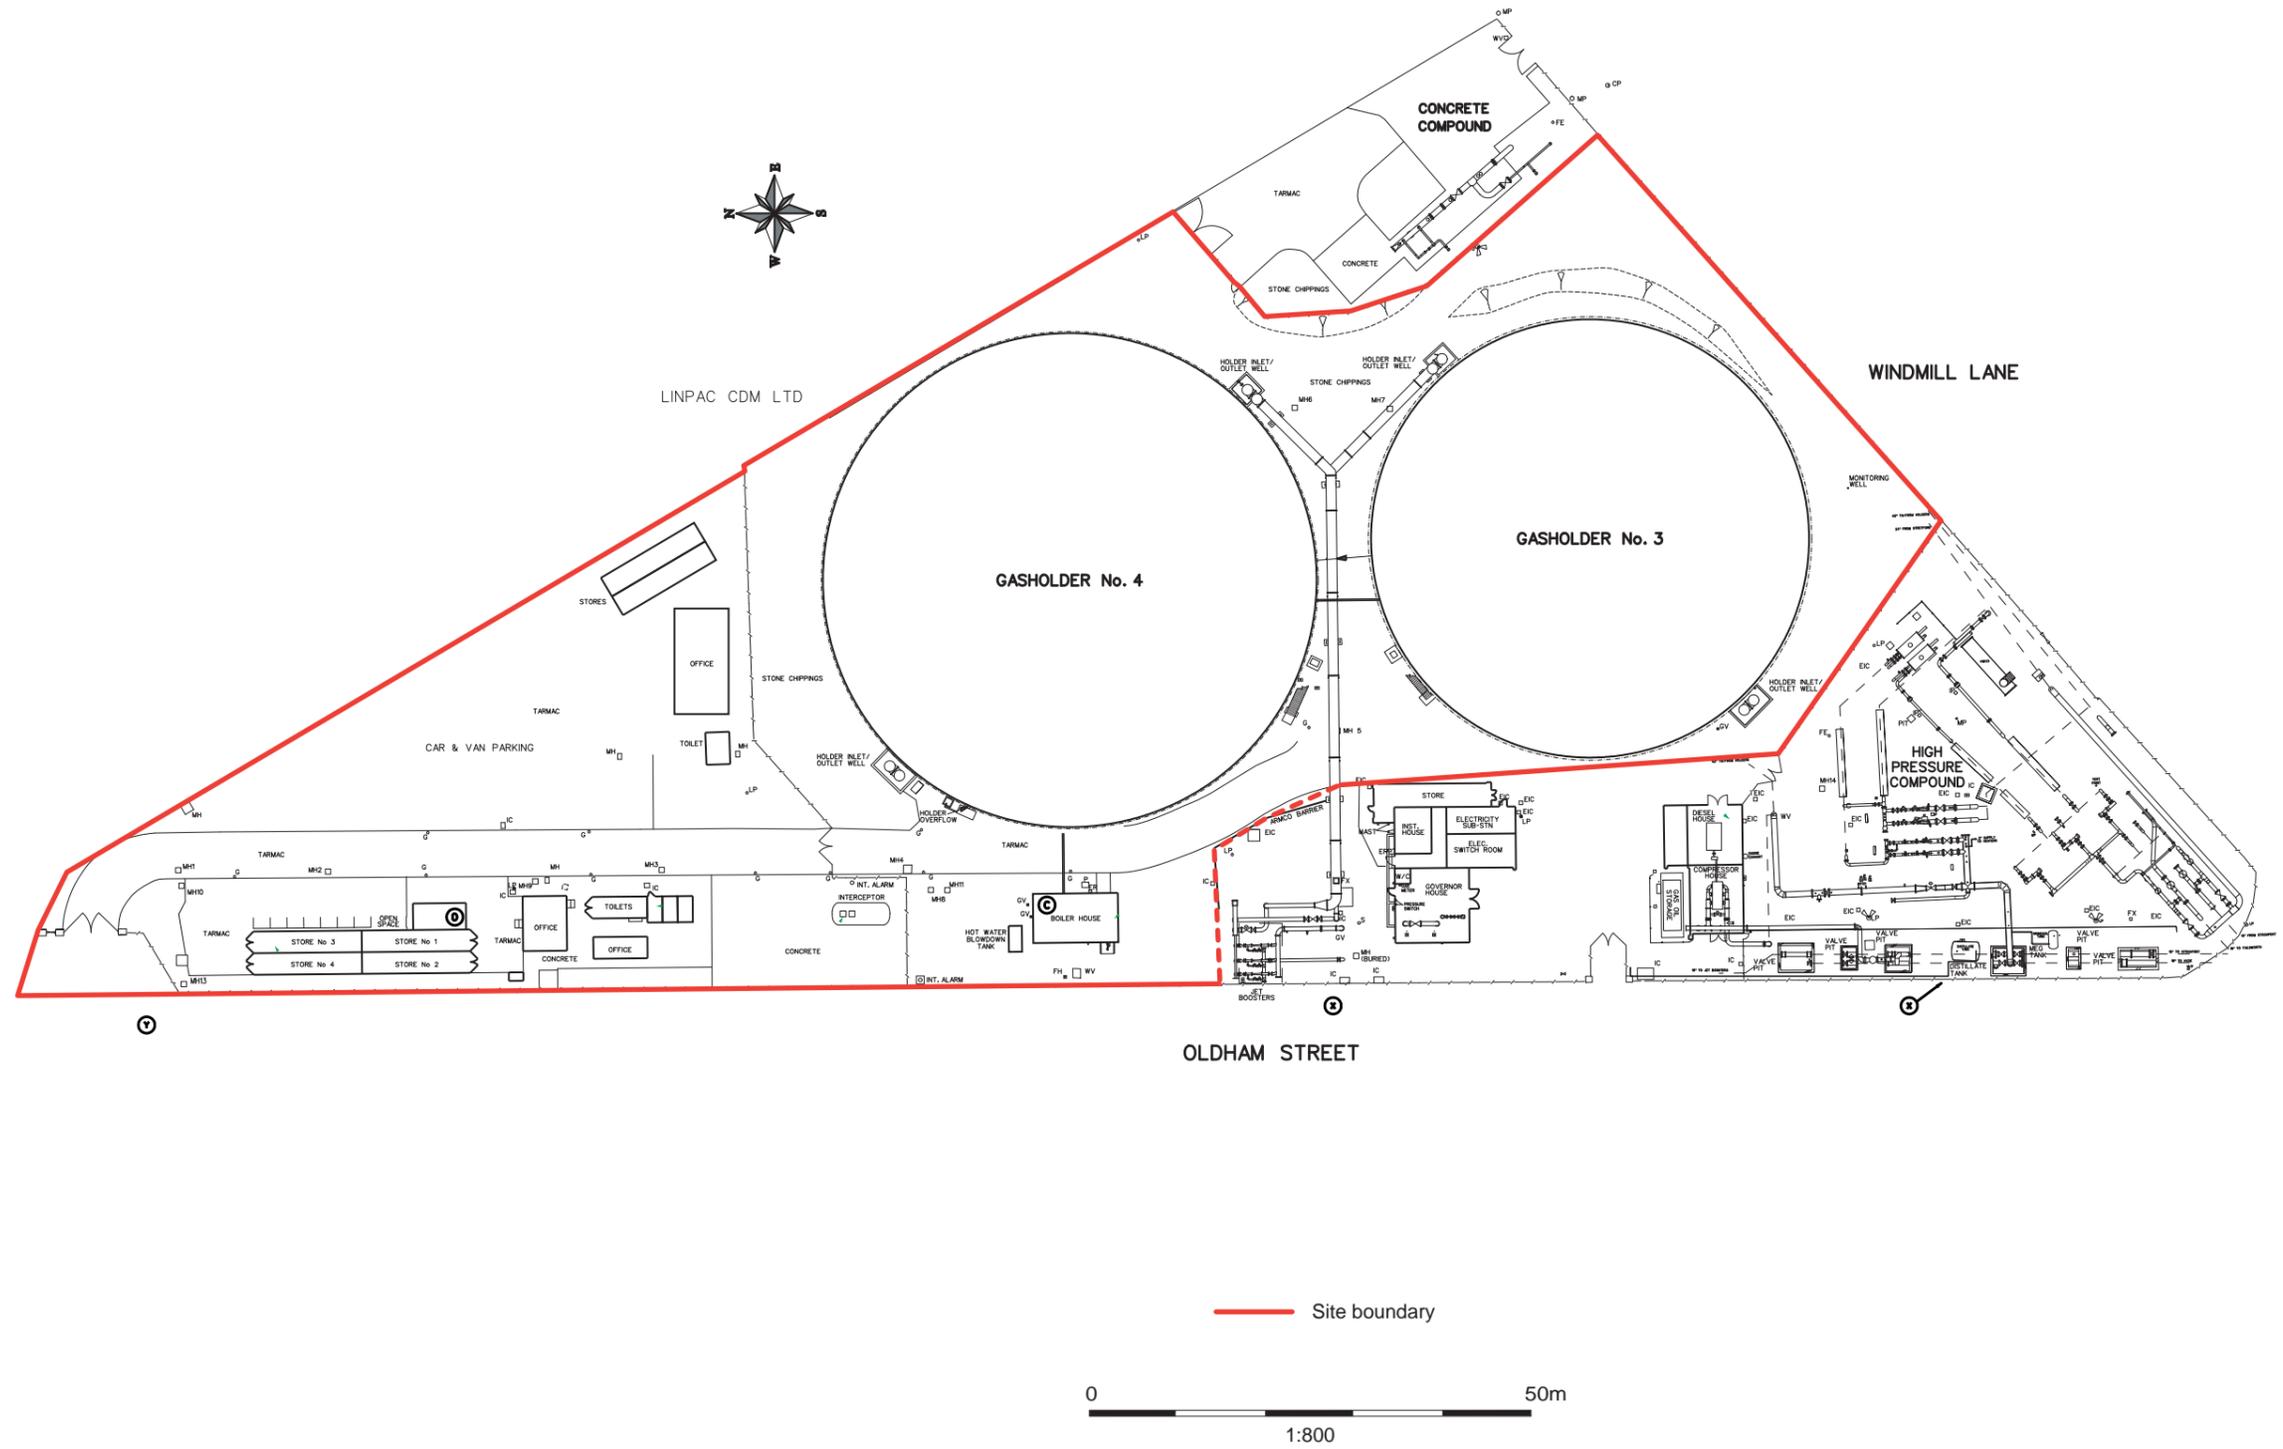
Site plan. Based upon the National Grid Drainage Plan dated April 2008
